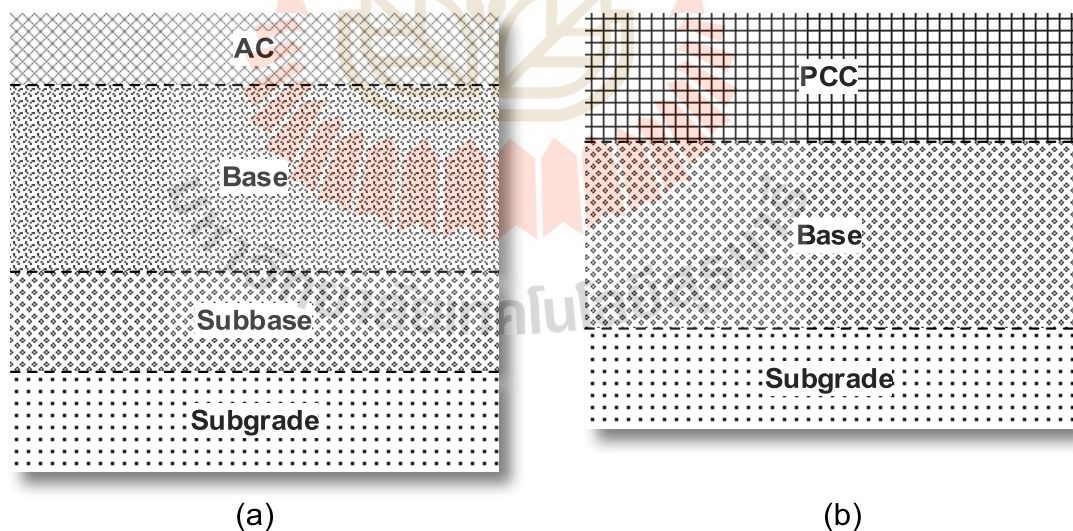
Typical cross-section of flexible pavement (a) and rigid pavement (b).
